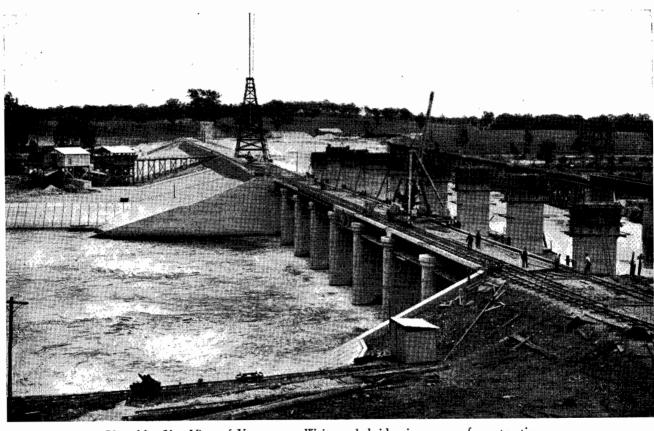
View of Yarrawonga Weir stock bridge in course of construction.
